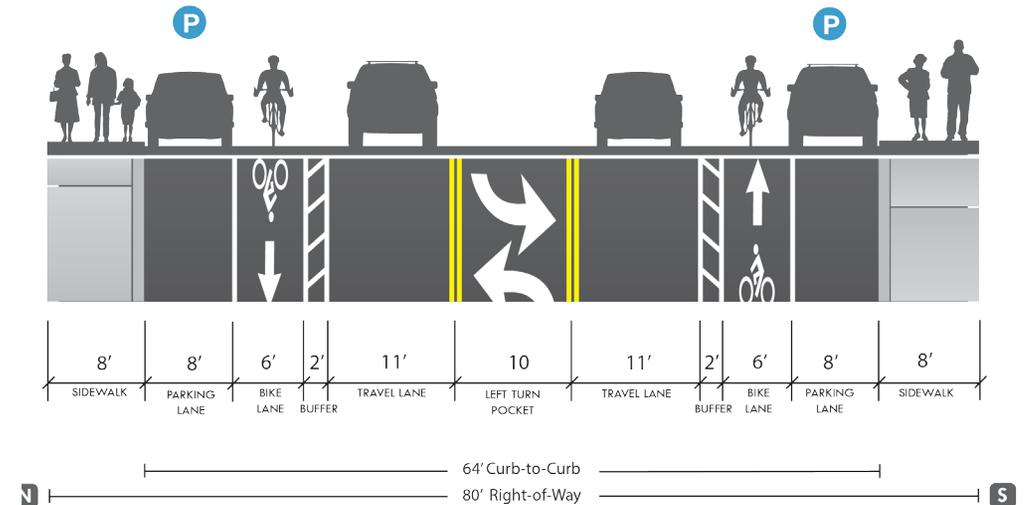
TYPICAL CROSS SECTION - PROPOSED
